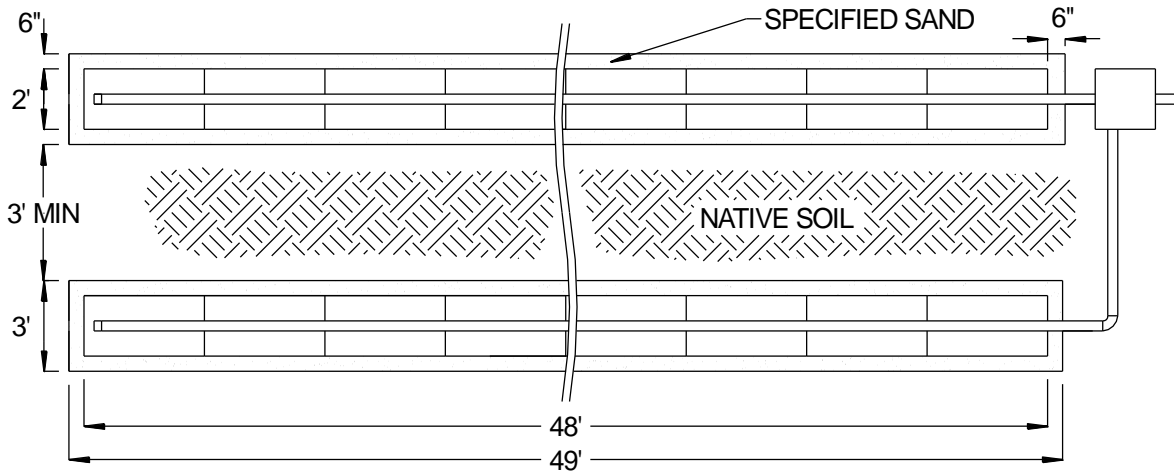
SECTION VIEW – TRENCH SYSTEM – LEVEL SITE
